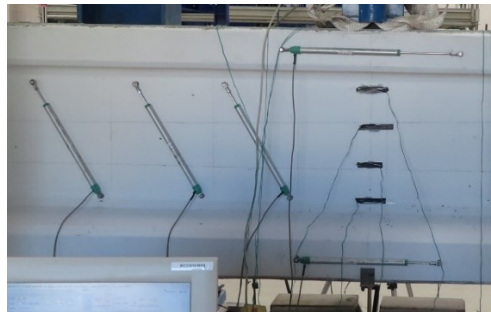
Arrangement of the instruments in the pre-stressed Beams A and B on the face side flanges and web.
